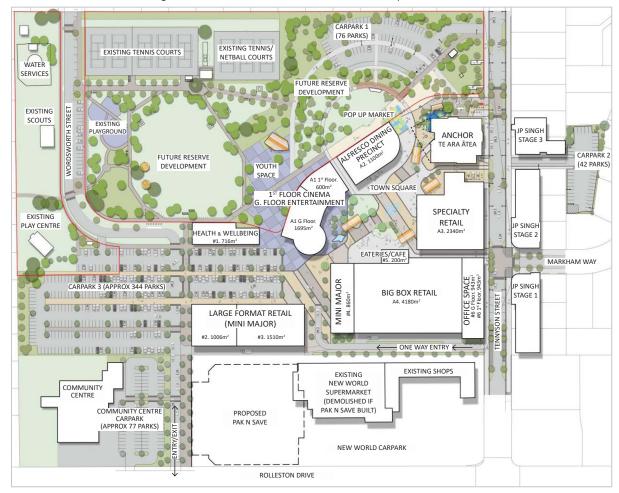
Rolleston Town Centre Preferred Concept Master Plan
